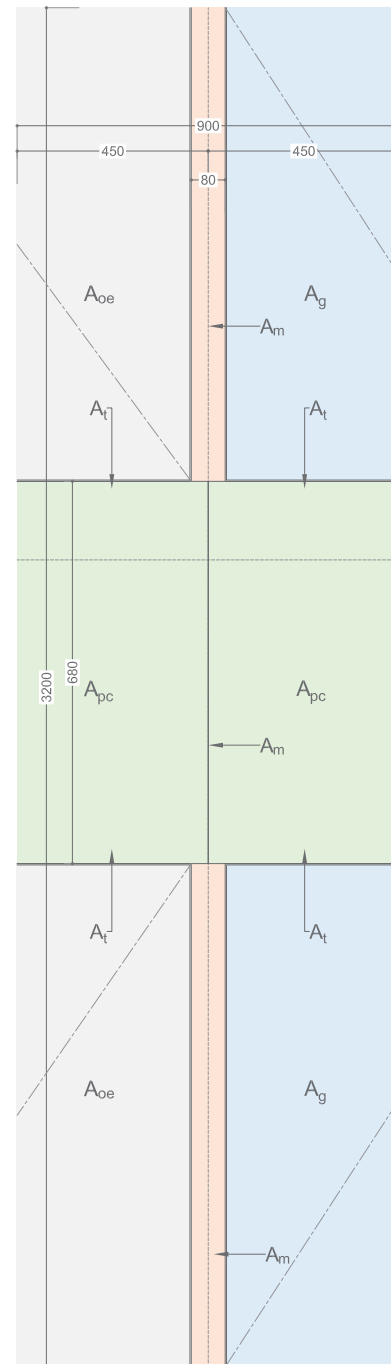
Enlarged elevation view showing surface areas of existing curtain wall for proposed case (Source – Author)
